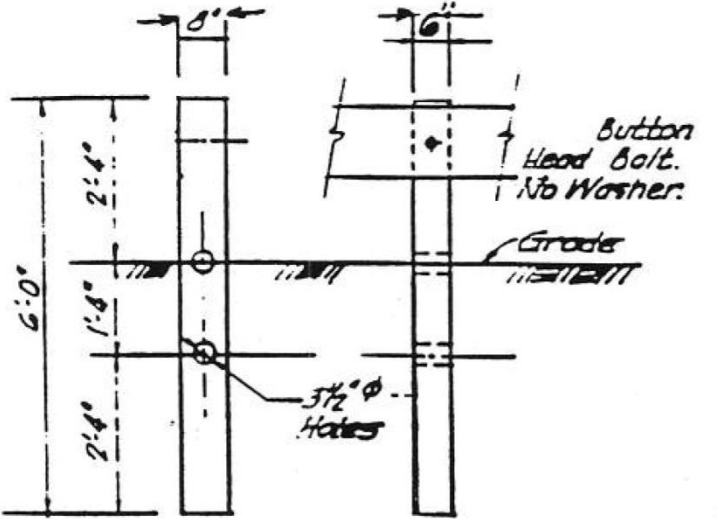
Cable Anchor and Foundation Details, Yuma County Short Radius Guardrail System [6]
